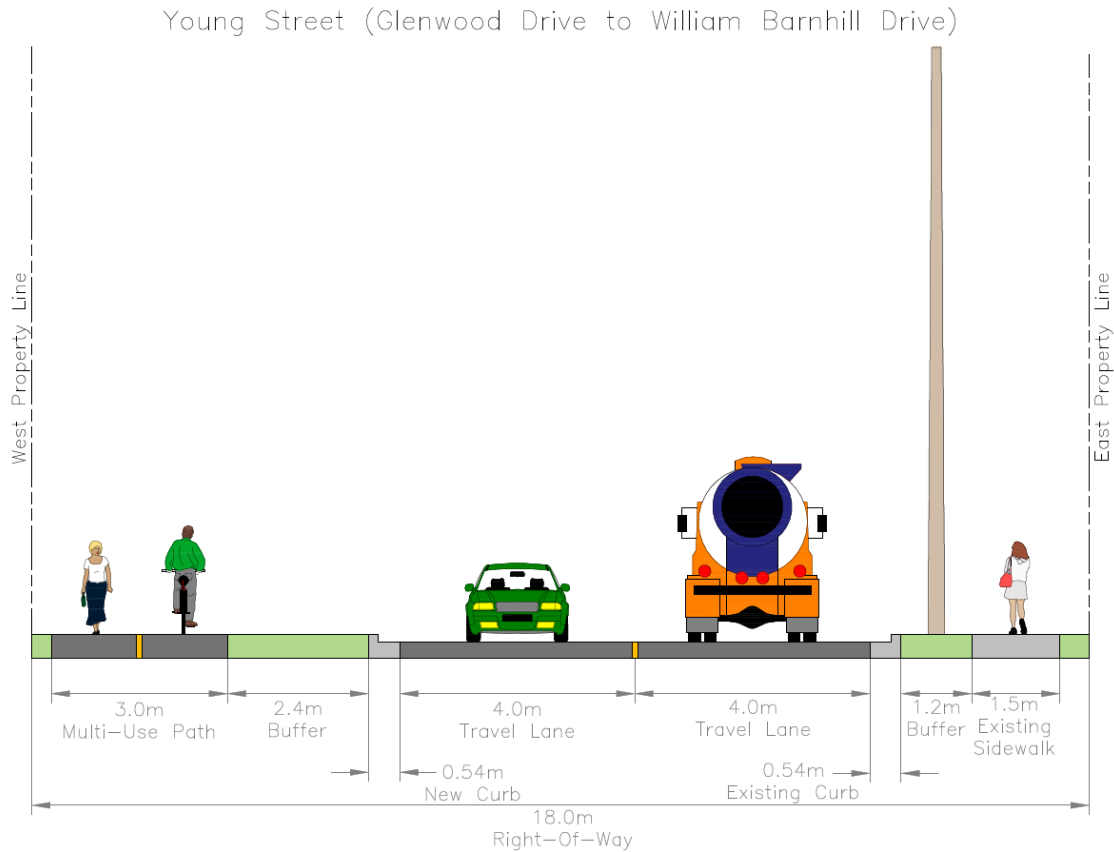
Young Street between Glenwood Drive and William Barnhill Drive, Revised Cross Section
